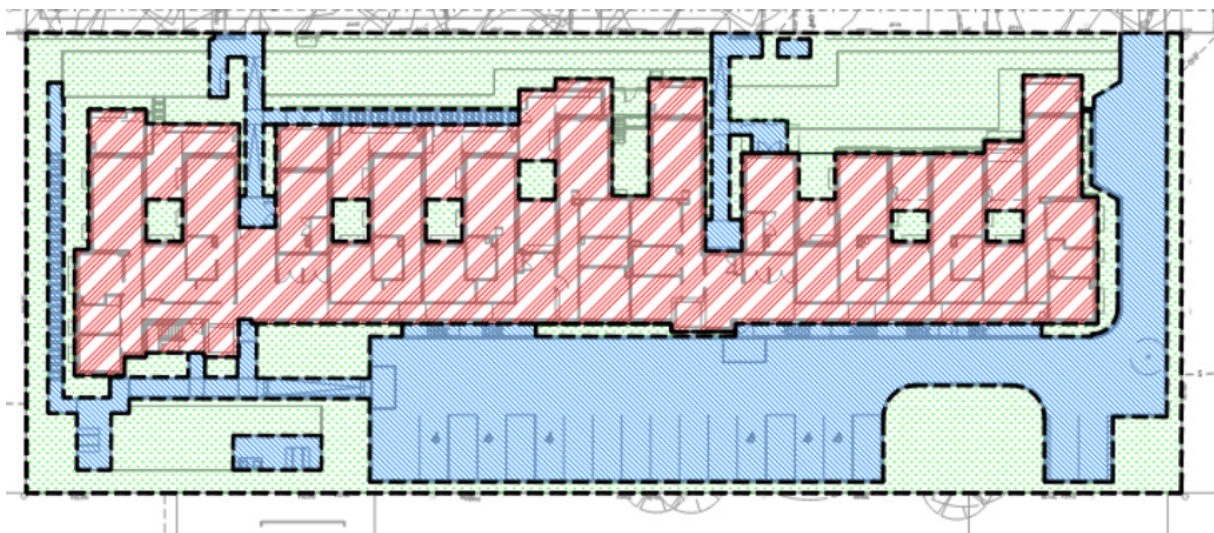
Post-development stormwater catchment plan. Henry and Hymas 2024
